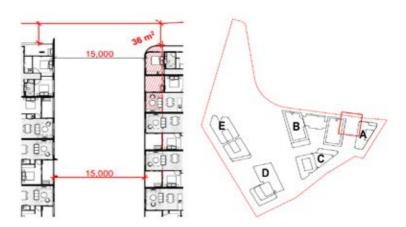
F1.4 Building A non-compliance plan & Key Plan Building B-B (internal)
